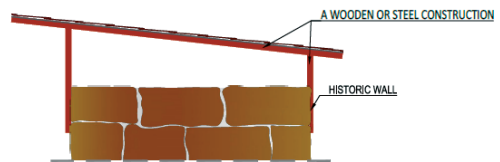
Roofing with the use of wooden or steel construction. /A wooden or steel construction / Historic wall/
